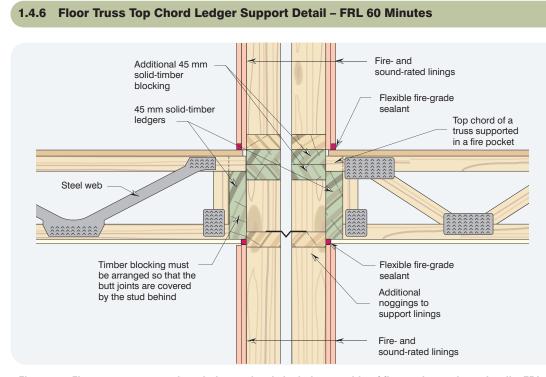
Floor truss supported on their top chords by ledger to side of fire- and sound-rated wall – FRL 60 minutes – elevation view.
